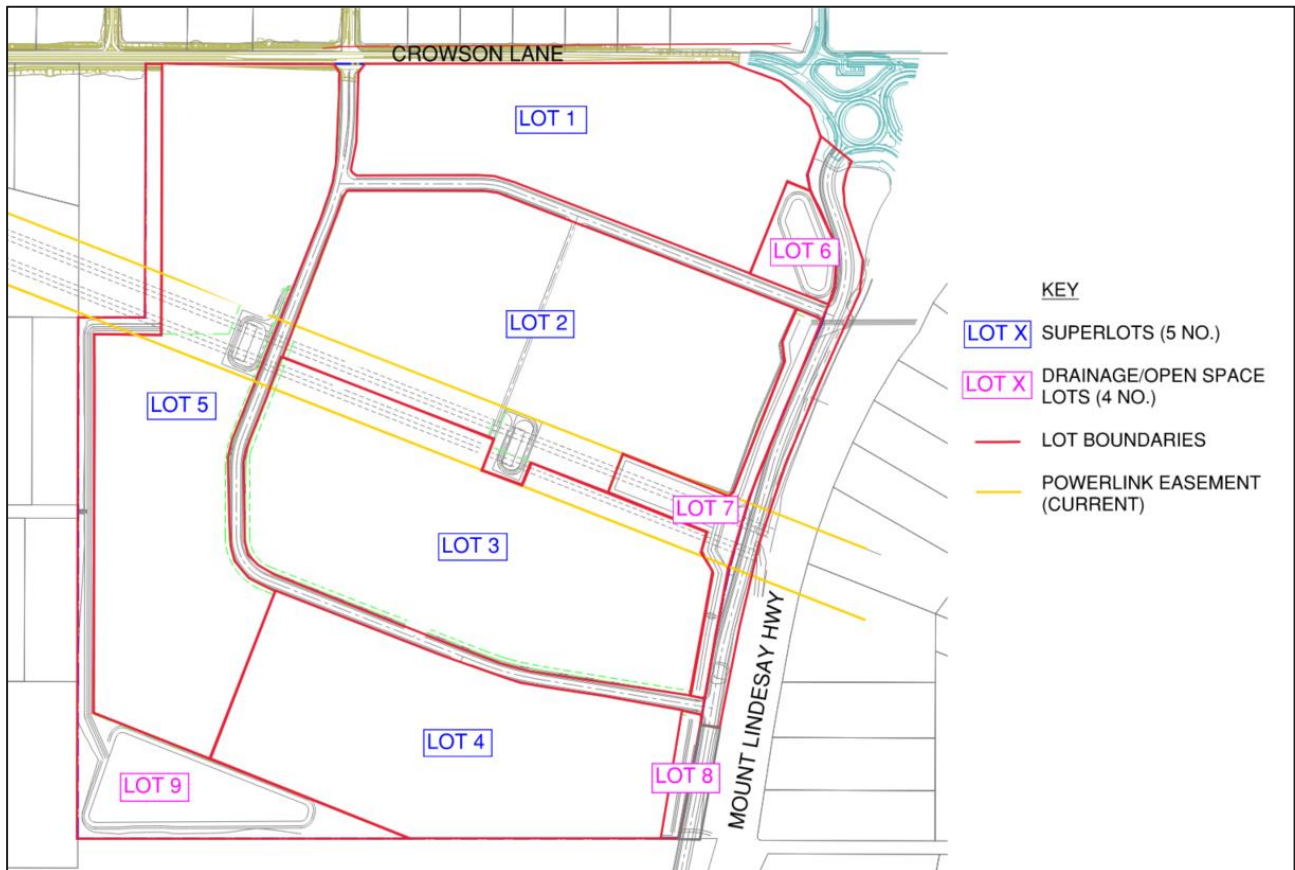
Proposed Development Superlot Plan (Watson Young MP01 P10, March 2022)
